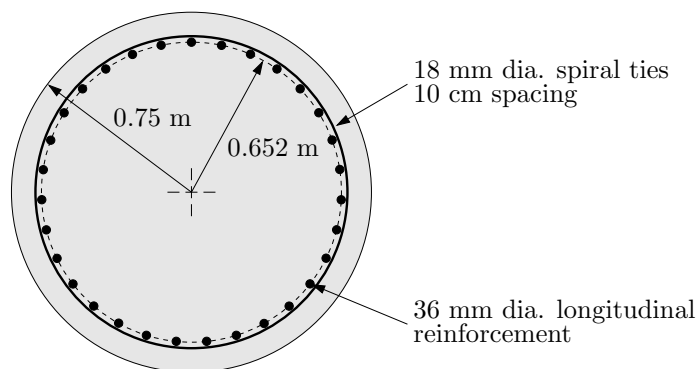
Dimensions and details of the model drilled shaft cross-section.
